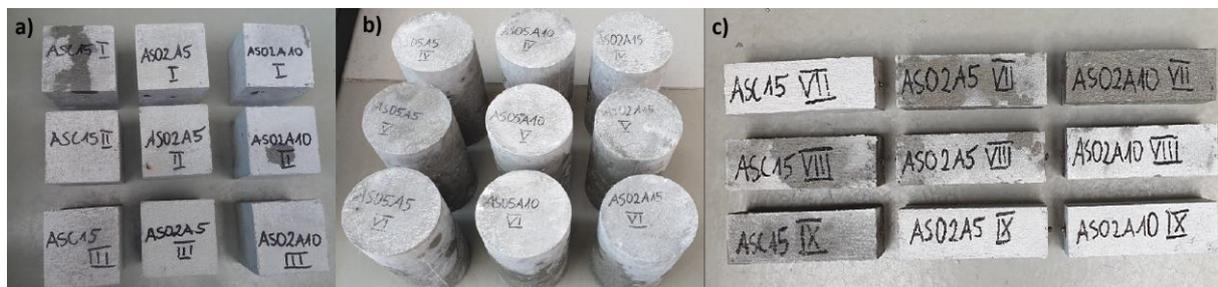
Test specimens: a) cubes 100x100x100 mm, b) cylinders 150/300 mm, c) beams 40x40x160 mm
